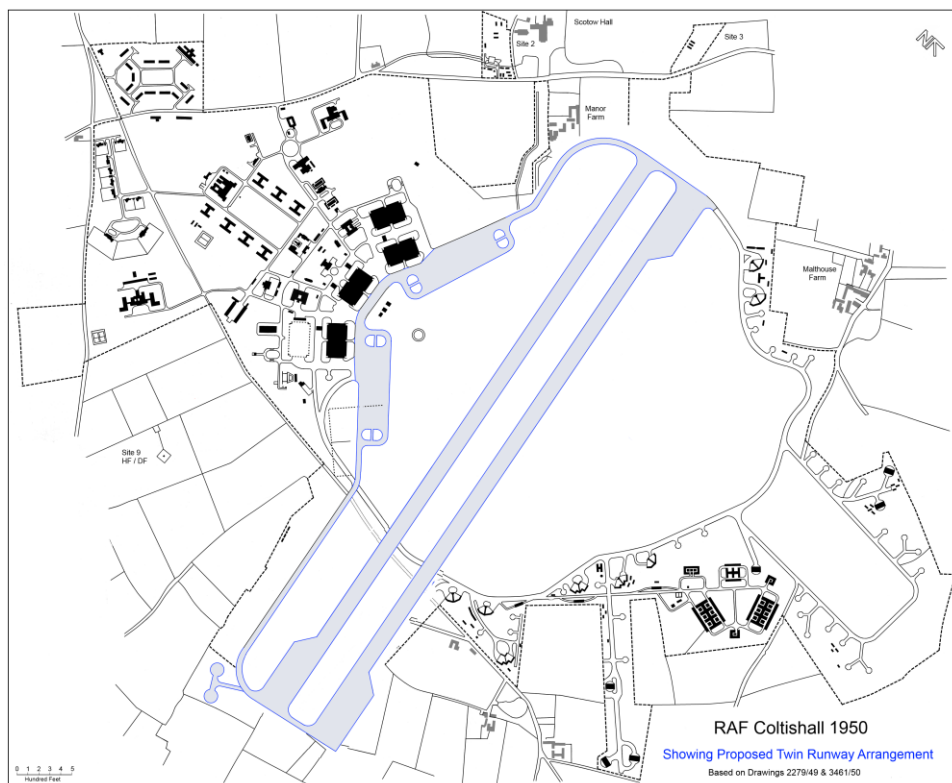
Proposed twin runway arrangement at Coltishall 1950
